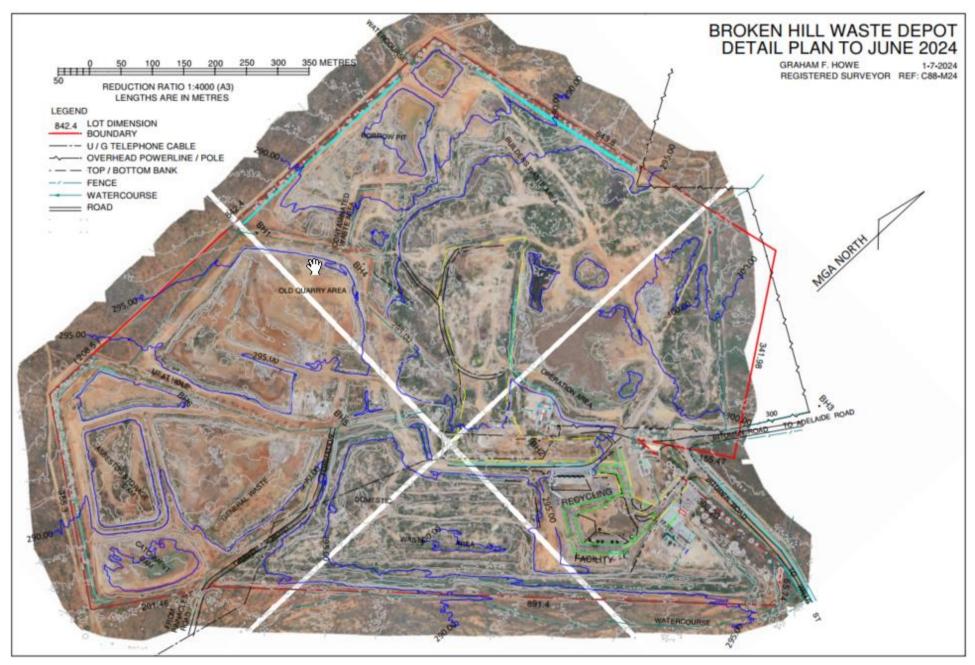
Broken Hill Waste Management Facility 2024 Survey Plan
